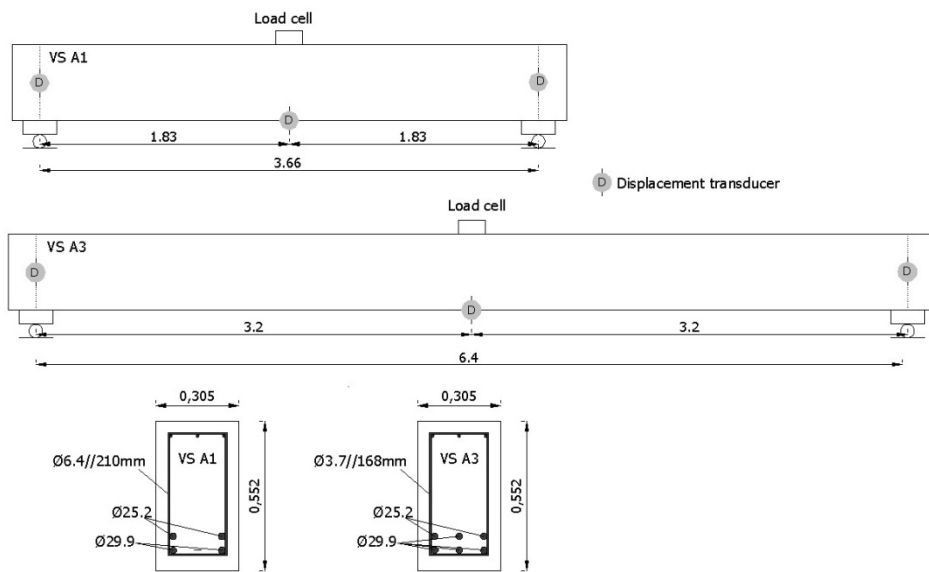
Geometry, reinforcement and instrumentation of the Vecchio and Shim beams
